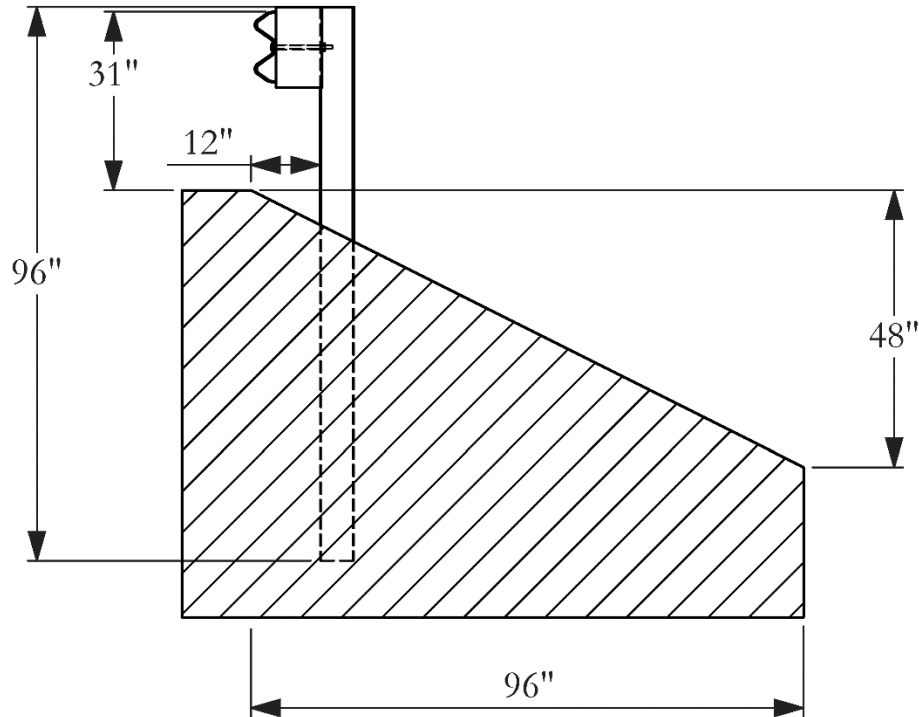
Cross Section of the Guardrail on Slope System Tested by Abu-Odeh et al. (3).
